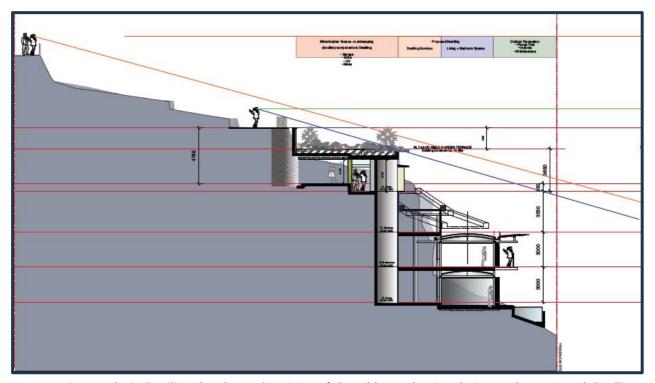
View Analysis detailing the elevated position of the Bible Garden in relation to the proposed dwelling (Source: Stephen Lesiuk Architect)
